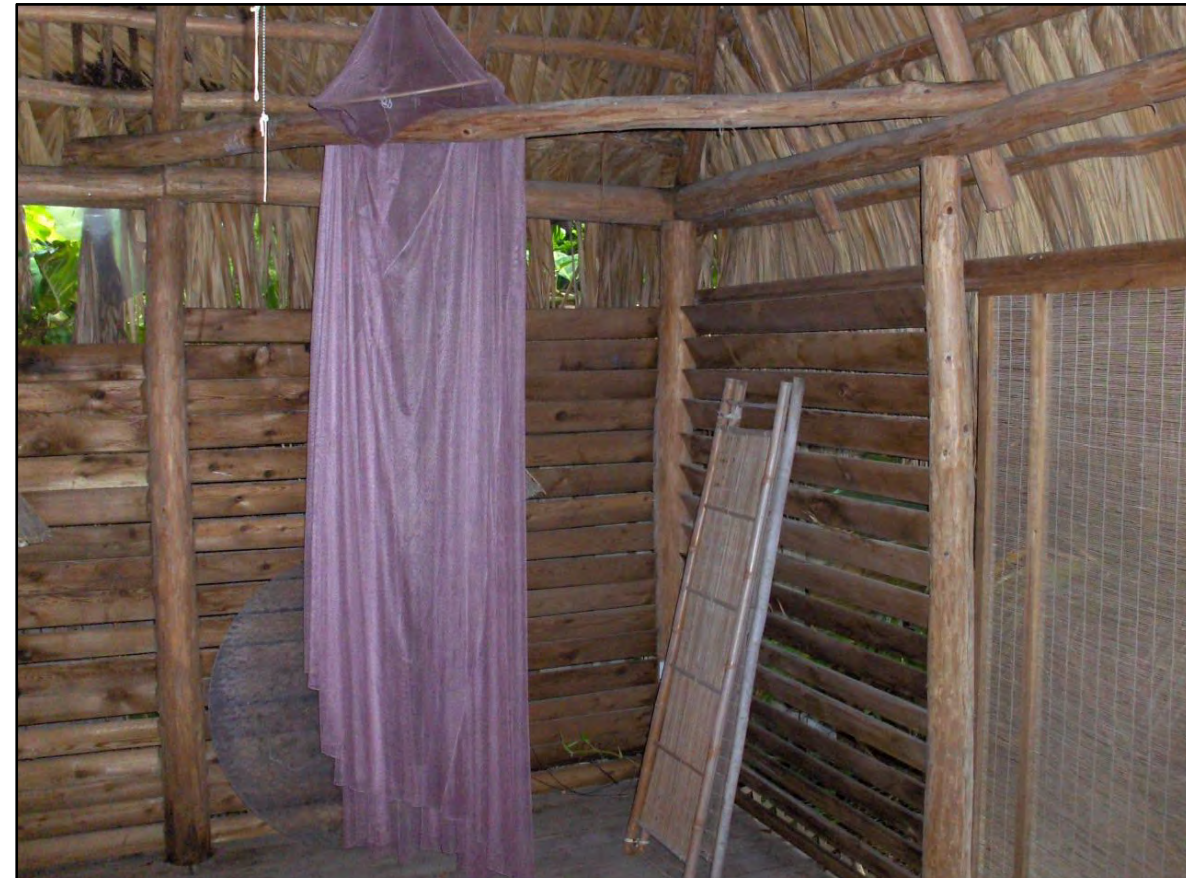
DETAIL PHOTOGRAPH SHOWING THE BOARD AND BATTEN AT HISTORIC STRUCTURE (SOUTH SIDE)
